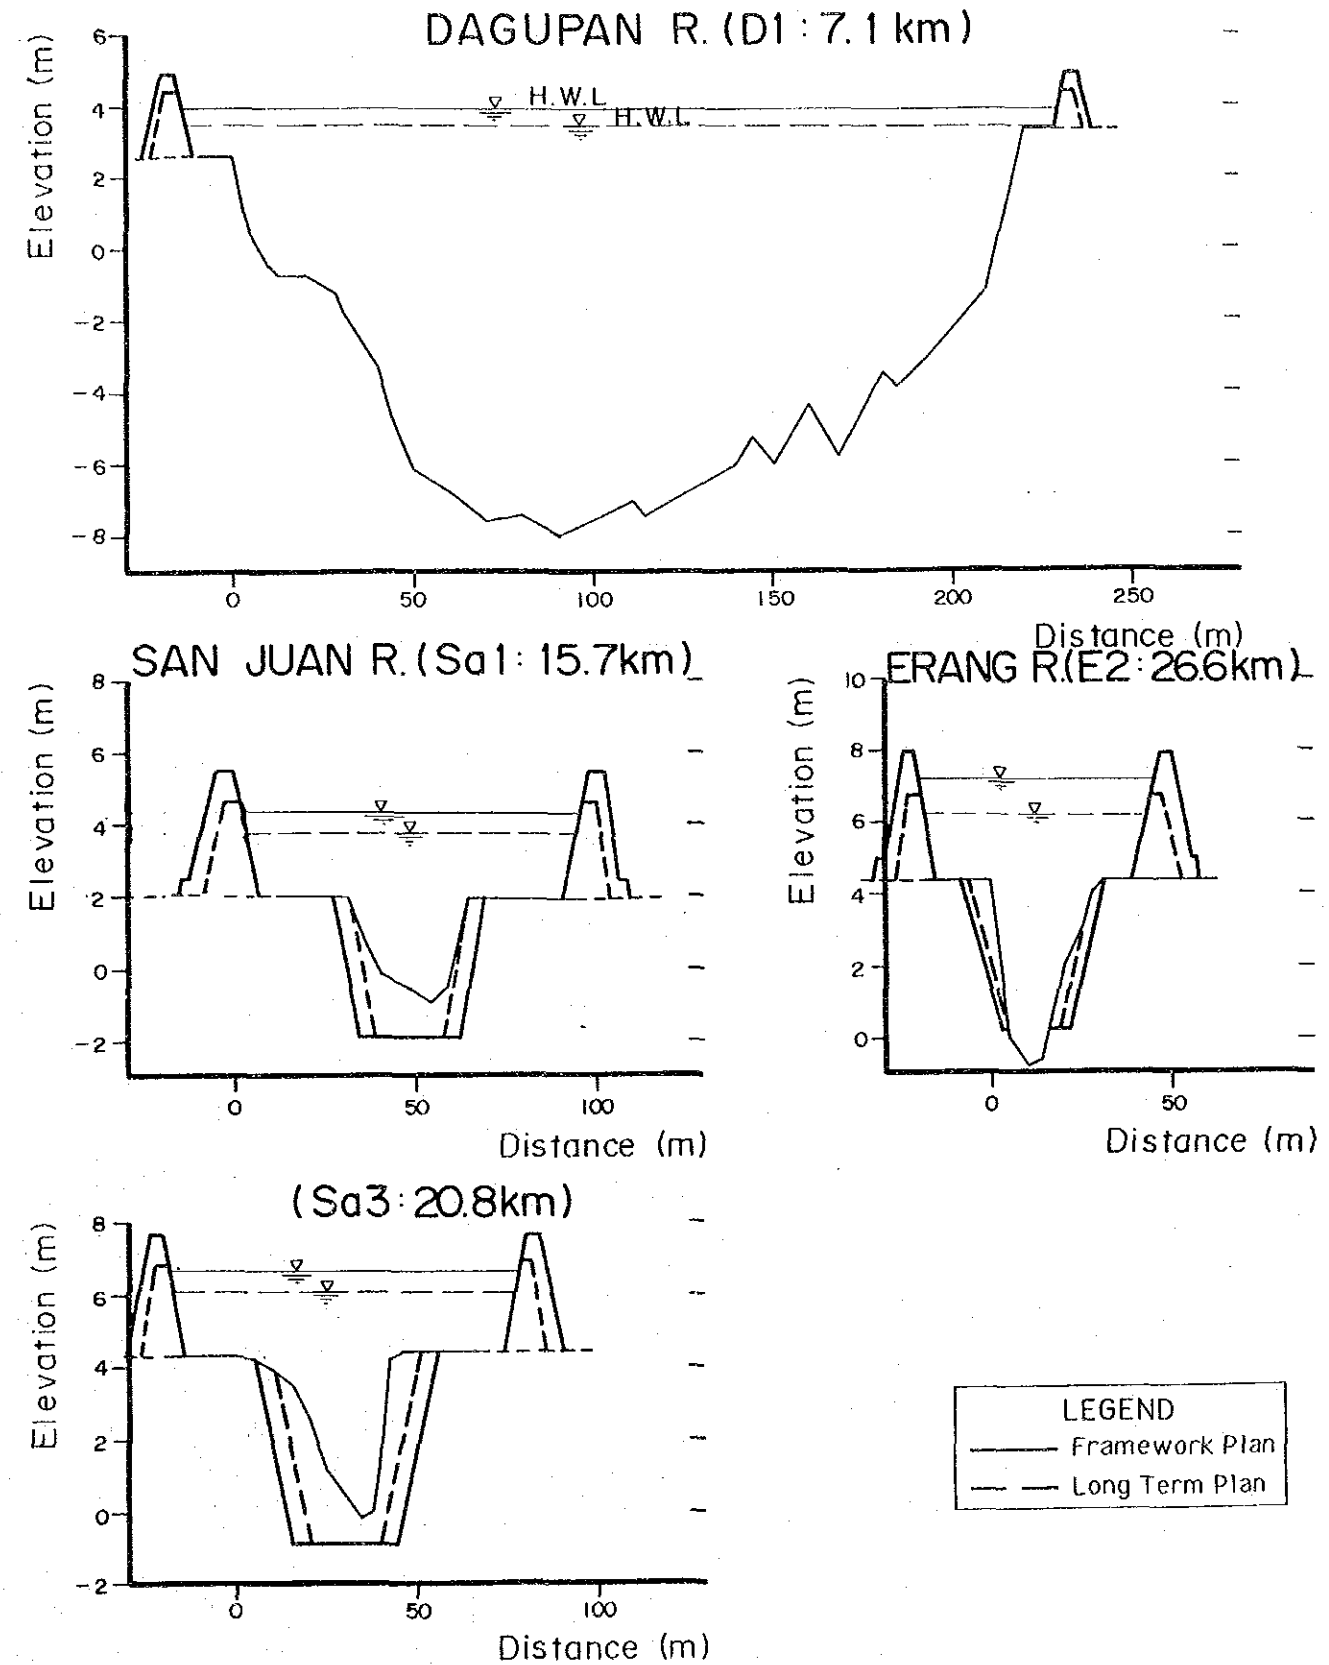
TYPICAL CROSS-SECTION OF DAGUPAN RIVER
